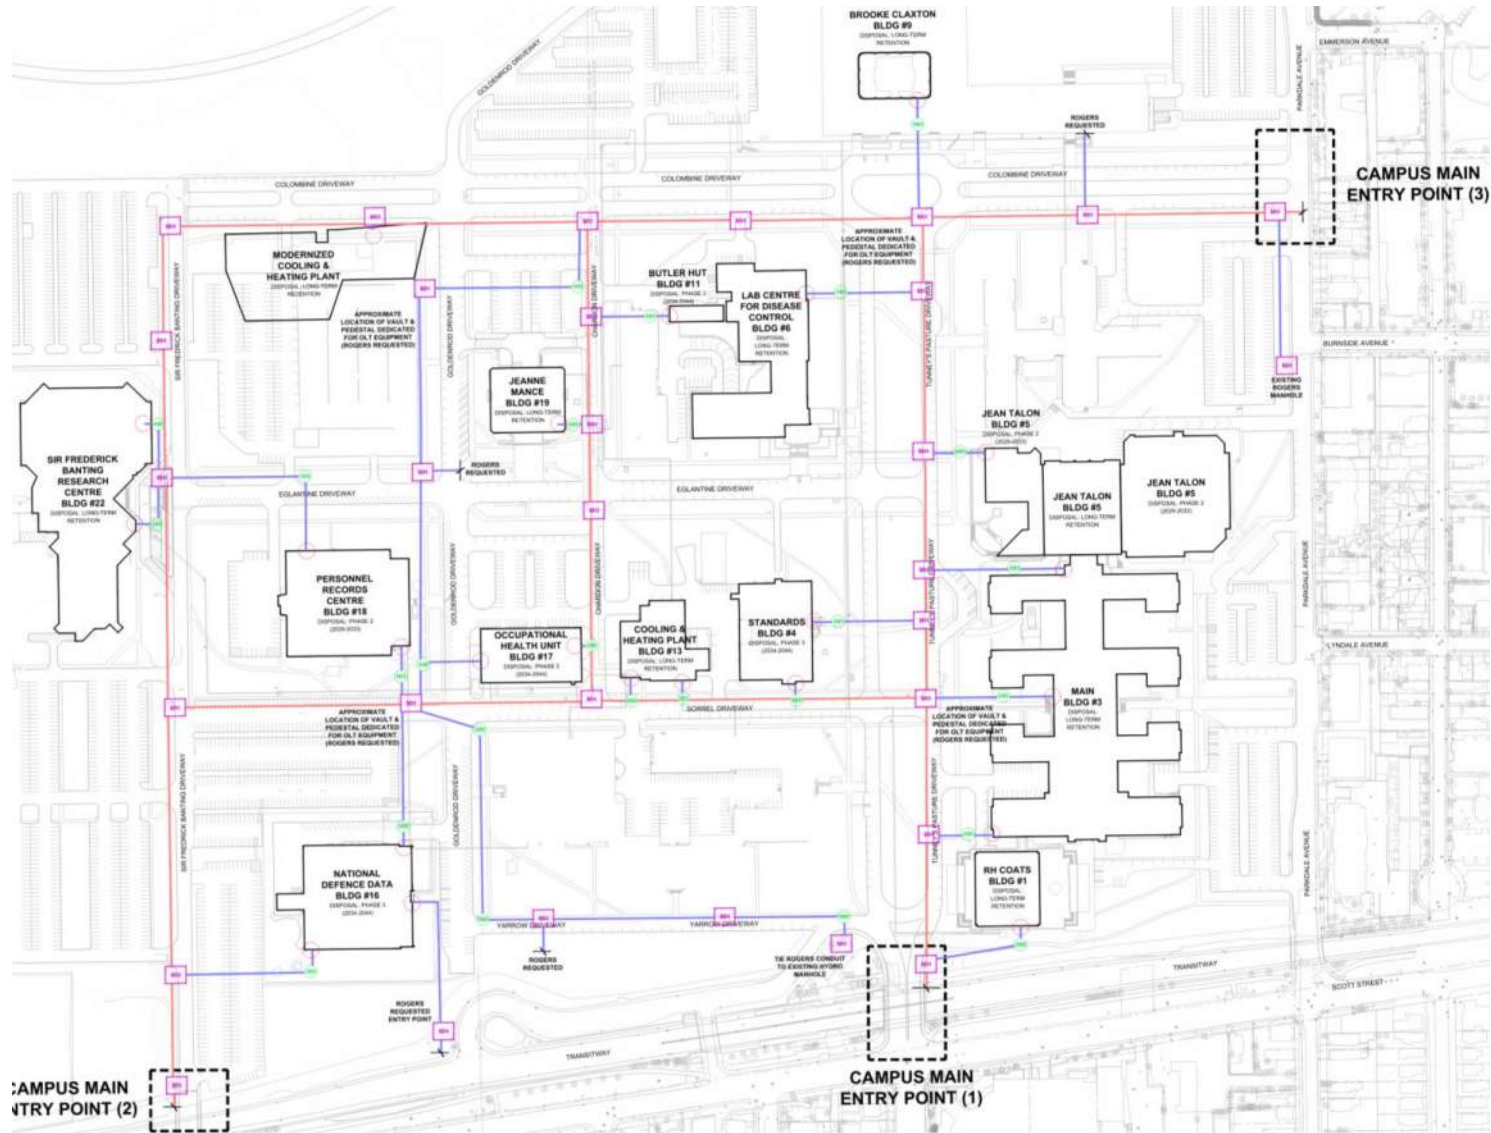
Attain's Proposed Underground Duct Infrastructure Plan (Pre-Emptive) (Attain Drawing Page #4)
